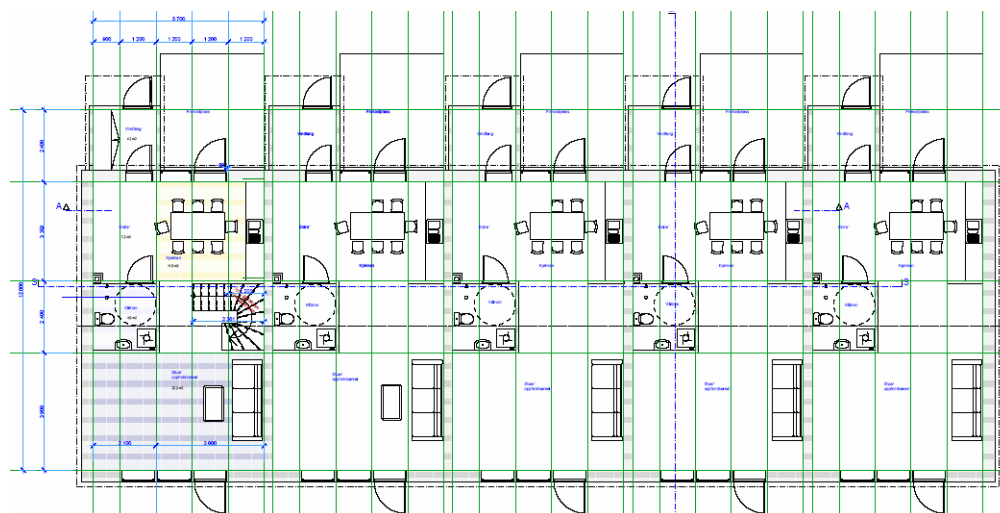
Ground floor of the five row houses at Smestadmoen Park, Lillehammer.
